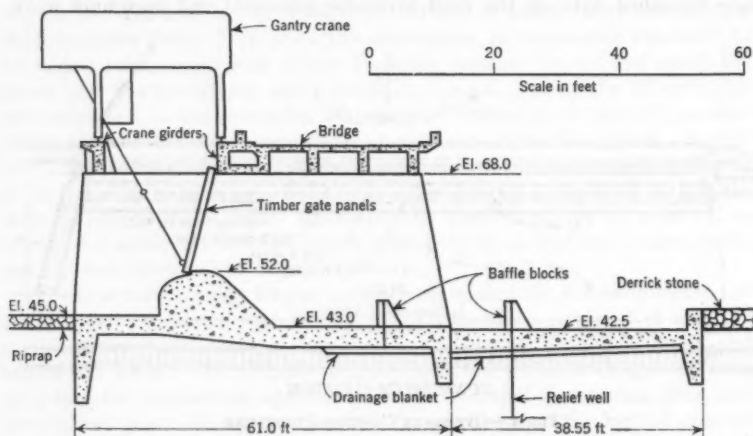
SECTION OF OVERBANK CONTROL STRUCTURE
